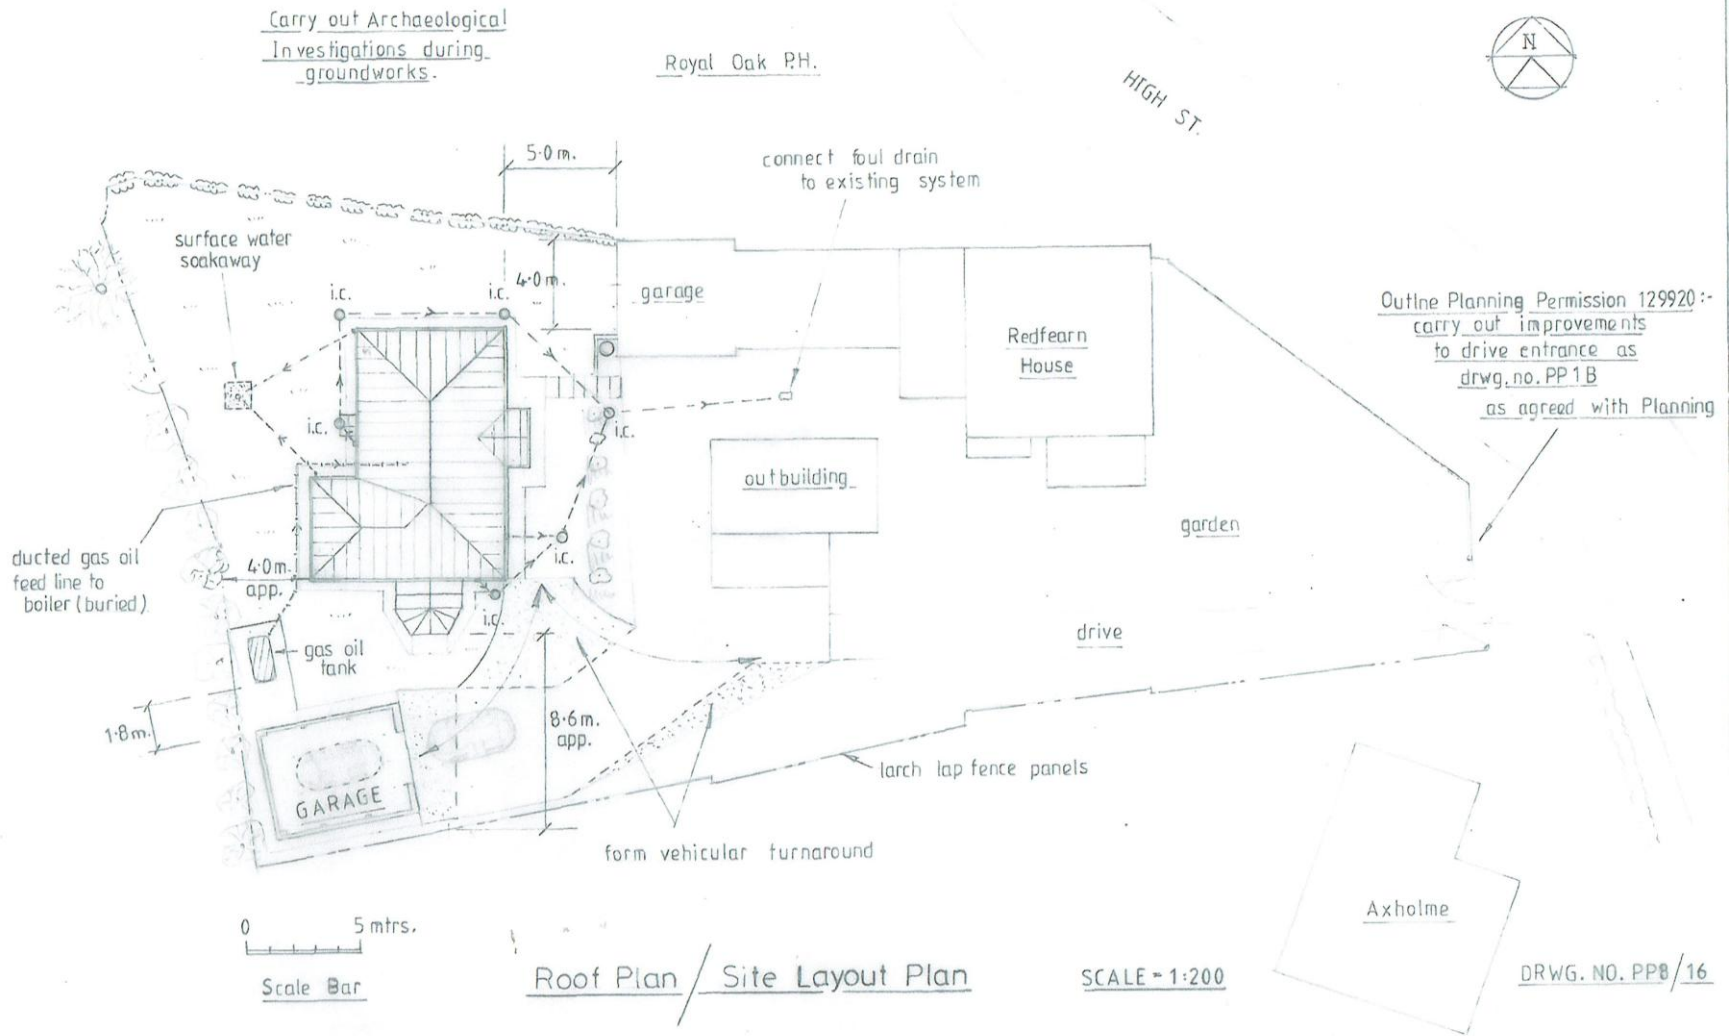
Block plan showing the proposed layout of the development site at an original scale of 1:200 (extract from Architects plan)
